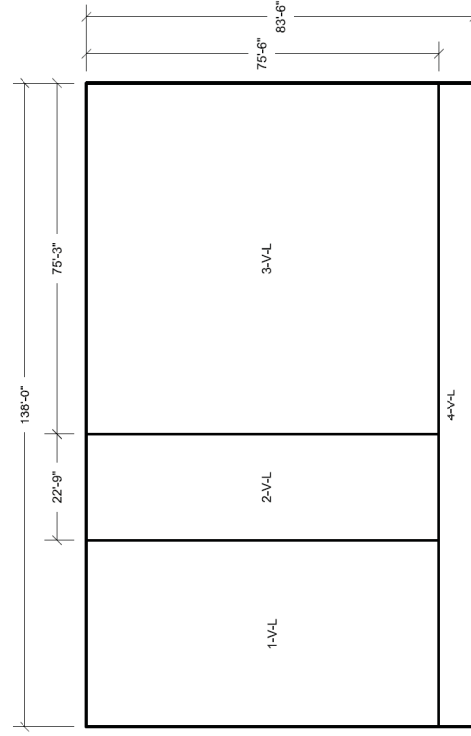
H.6-95: LHS BASIN EAST WALL LOOKING WEST
